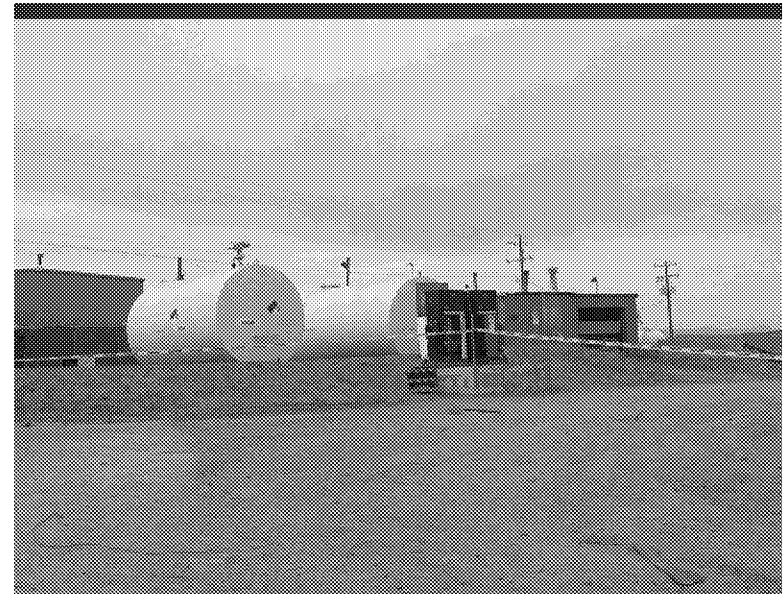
Undamaged tanks in tank farm adjacent to Stabilization Building.
